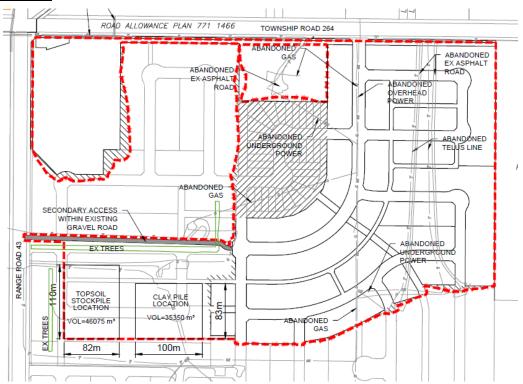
Site Plan (Intended Use Areas) See Attachment B
